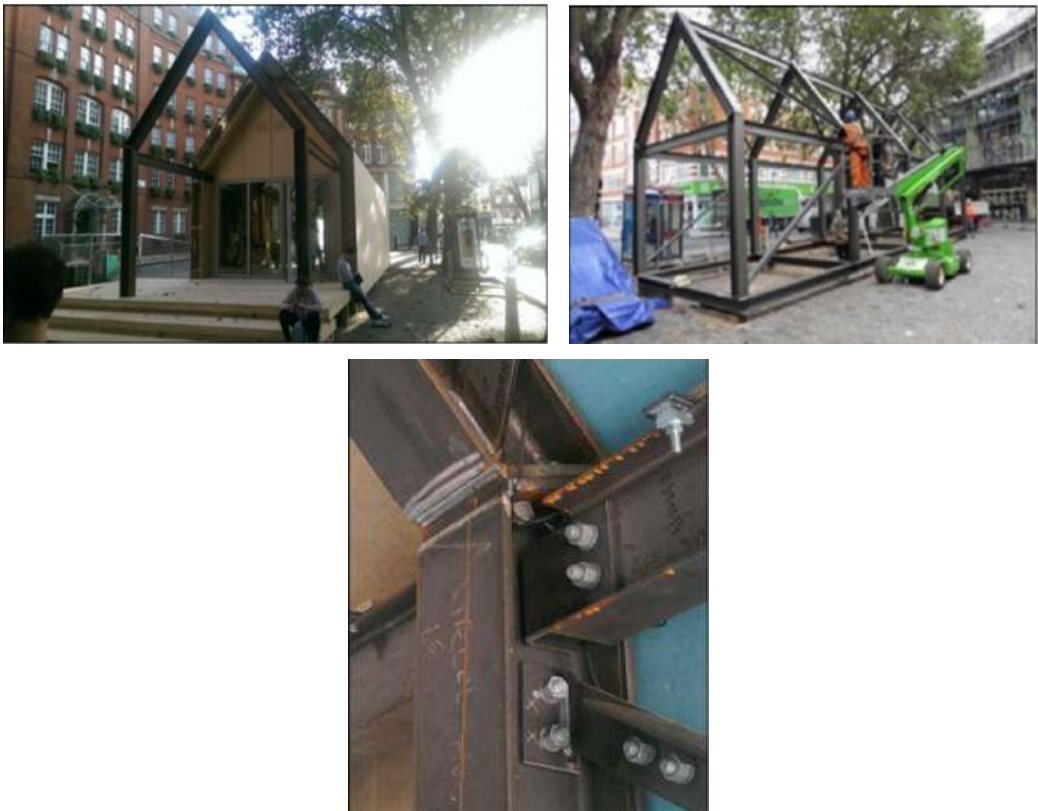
Circular building, London, erection of steel frame, and structural connection detail
